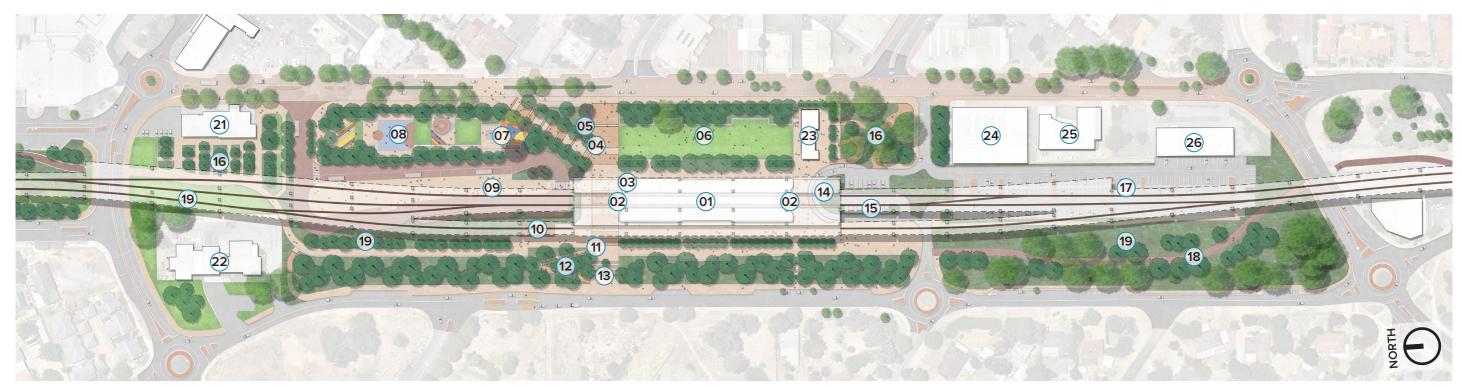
LANDSCAPE MASTER PLAN - SOUTH OF FORREST ROAD
